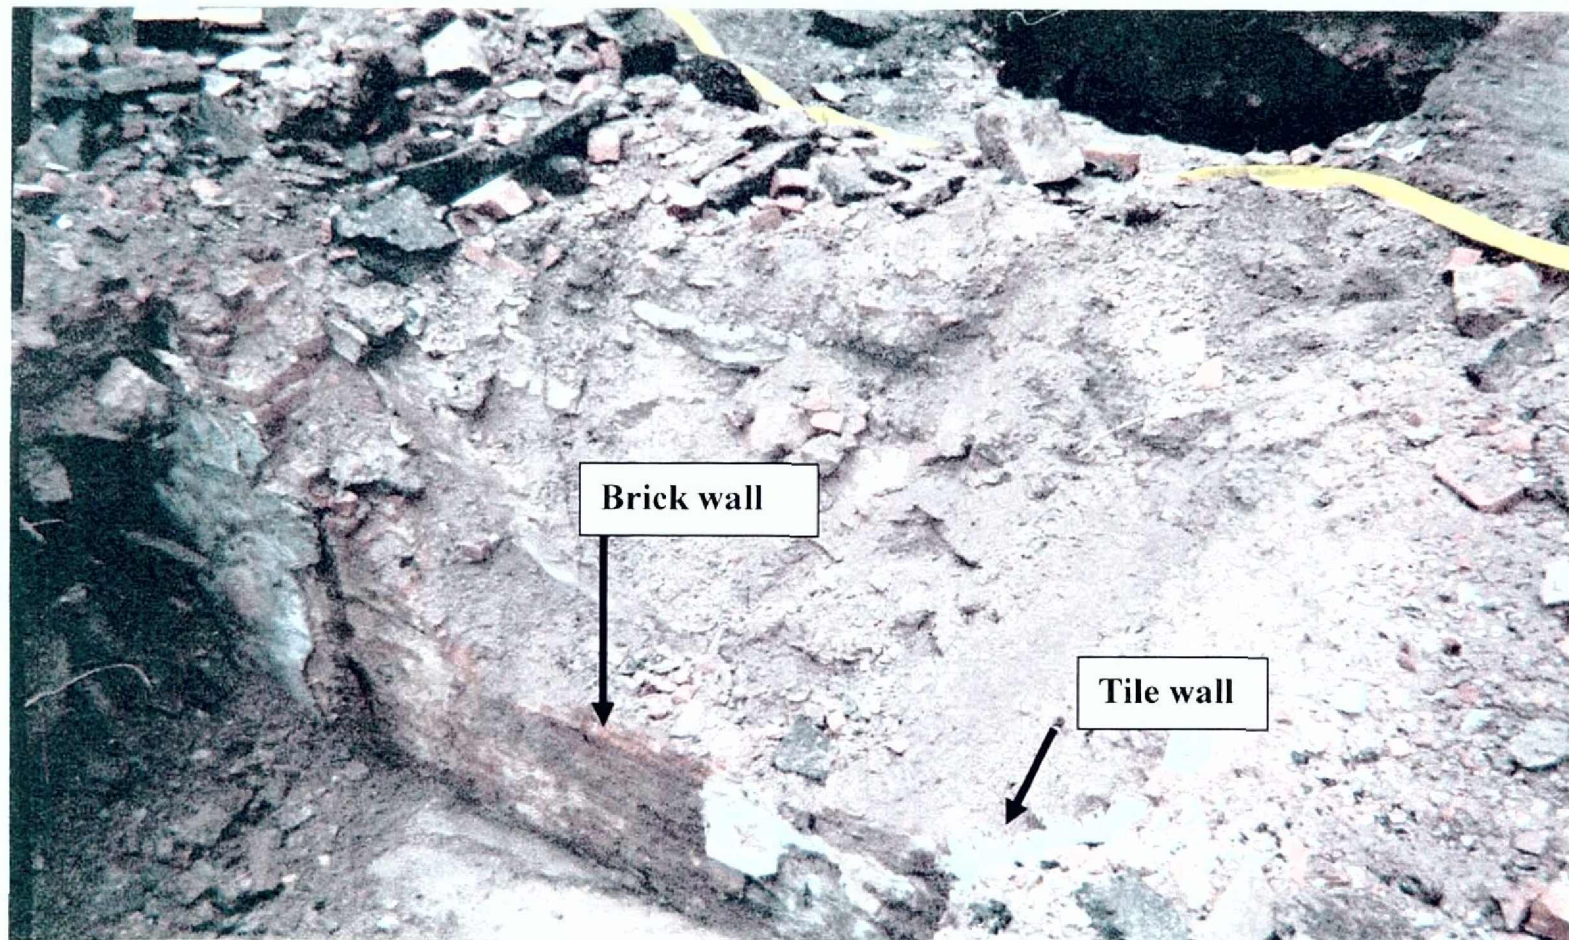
TP-5: Facing South-Close-up of opening in concrete slab.
